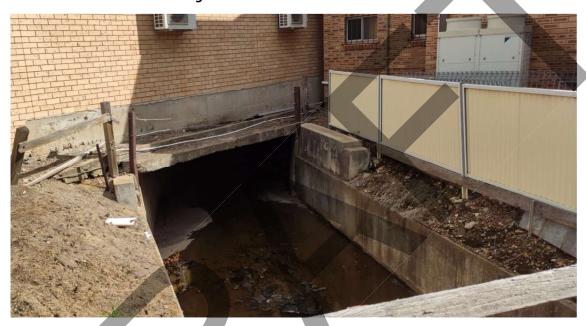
Photo of the Figtree Gully box culvert beneath Kelly Street
